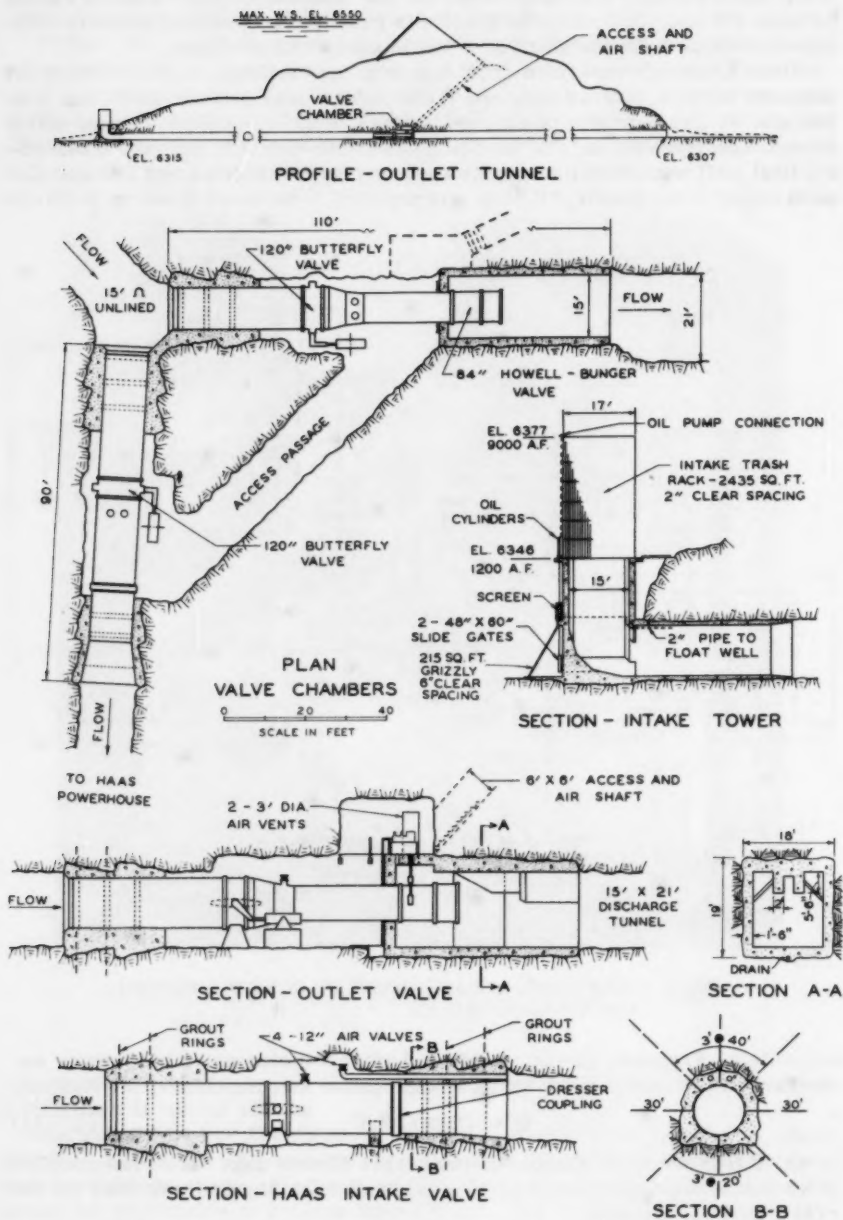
WISHON DAM OUTLET WORKS HAAS INTAKE WORKS
